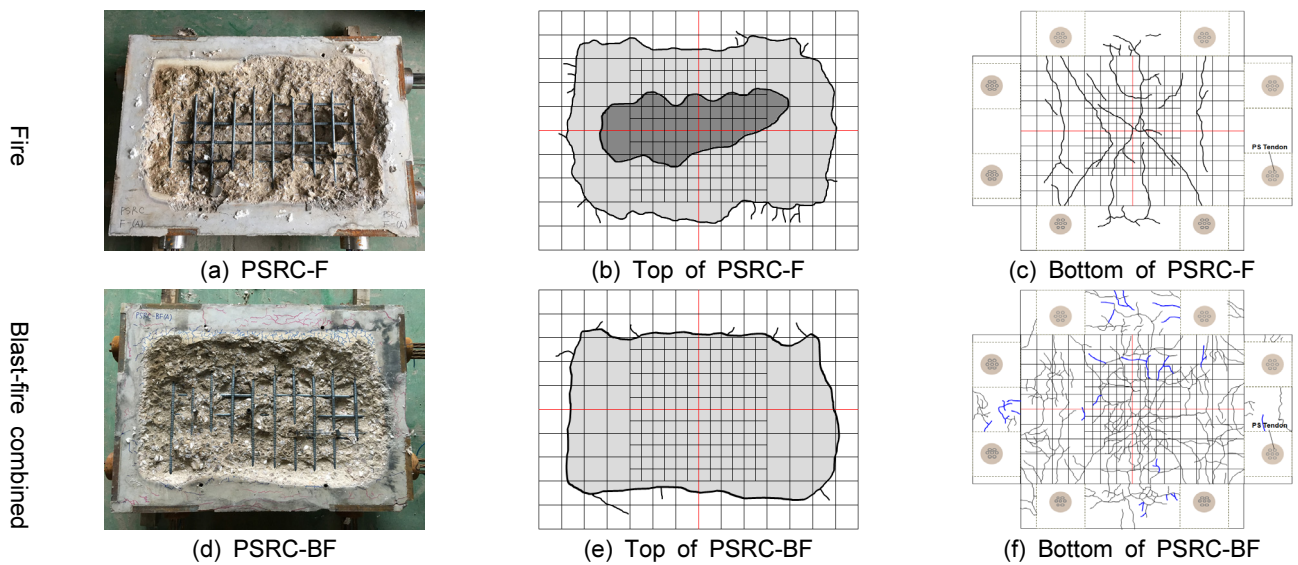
Damaged surface and crack profile of fire and blast-fire tested PSRC panel
